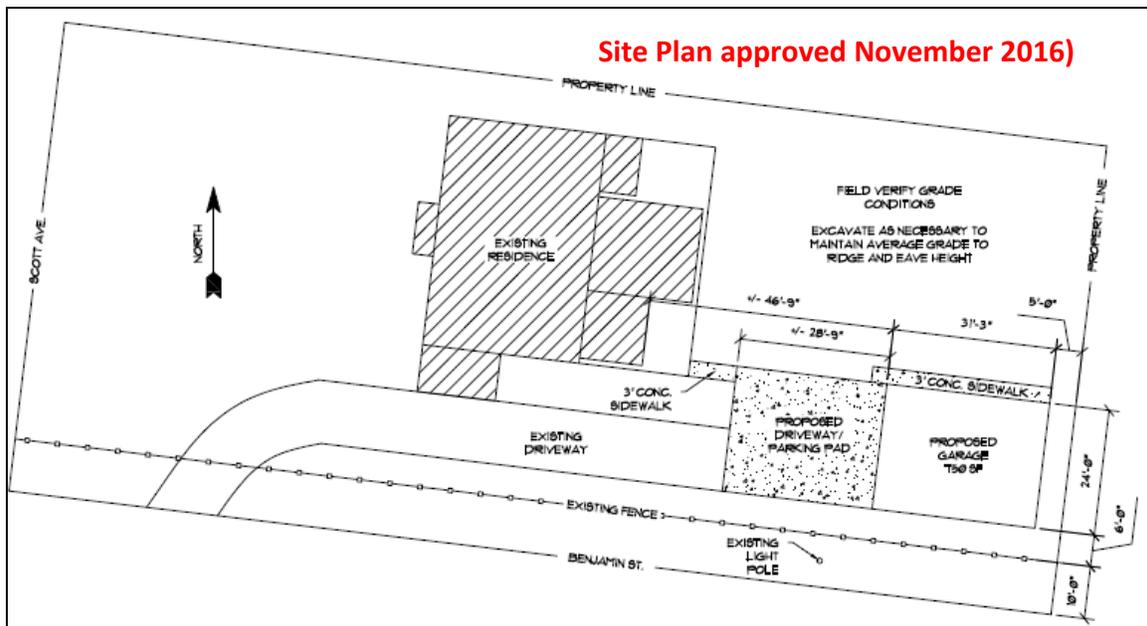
The previously approved site plan assumed, erroneously, that the property line was at the street line, but it is in fact in the location of the existing fence.
